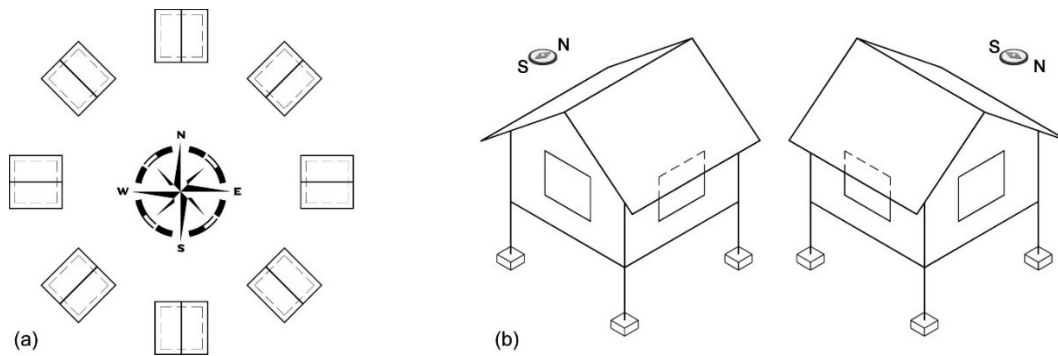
(a) Typical model in a plan for orientation studies; (b) Typical model for window-to-wall-ratio simulation with north-south direction gable roof
